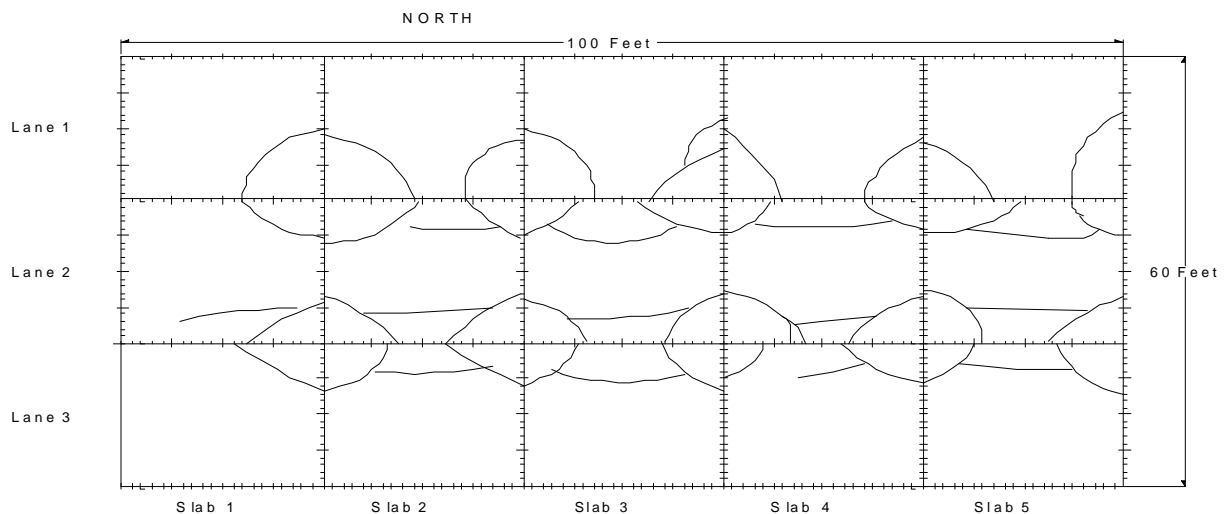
Concrete Cracks on Medium-Strength Subgrade Rigid Test Item
